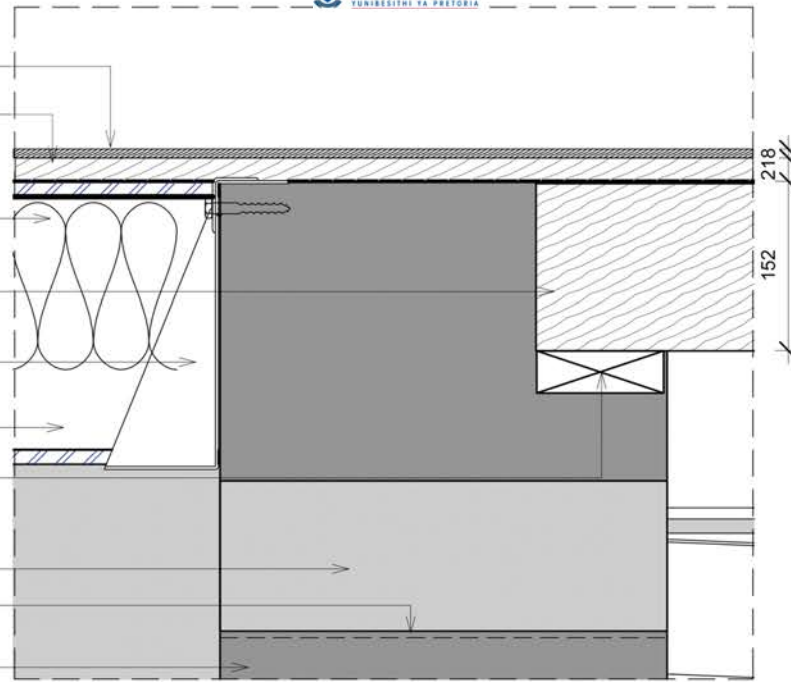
Detail 1 suspended floor construction, not to scale (Author 2018)
